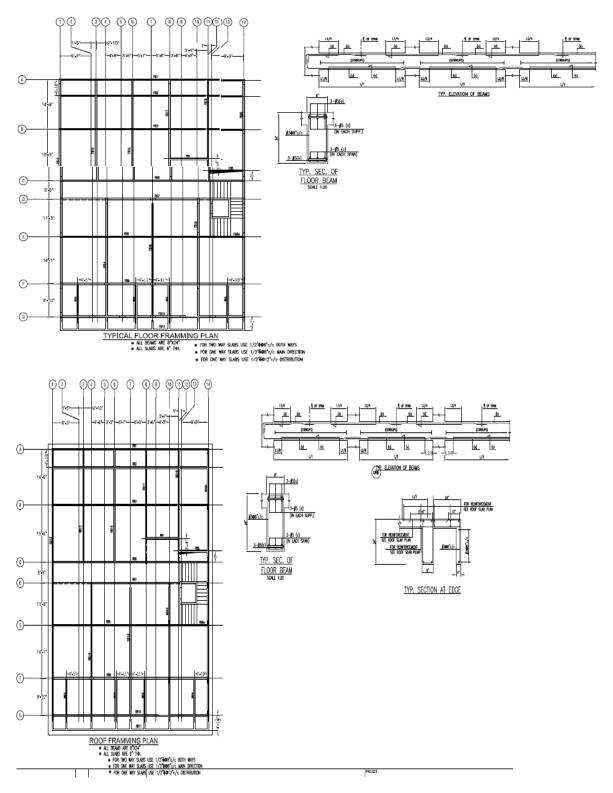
Structural framing for typical residential floor (top) and roof (bottom)
